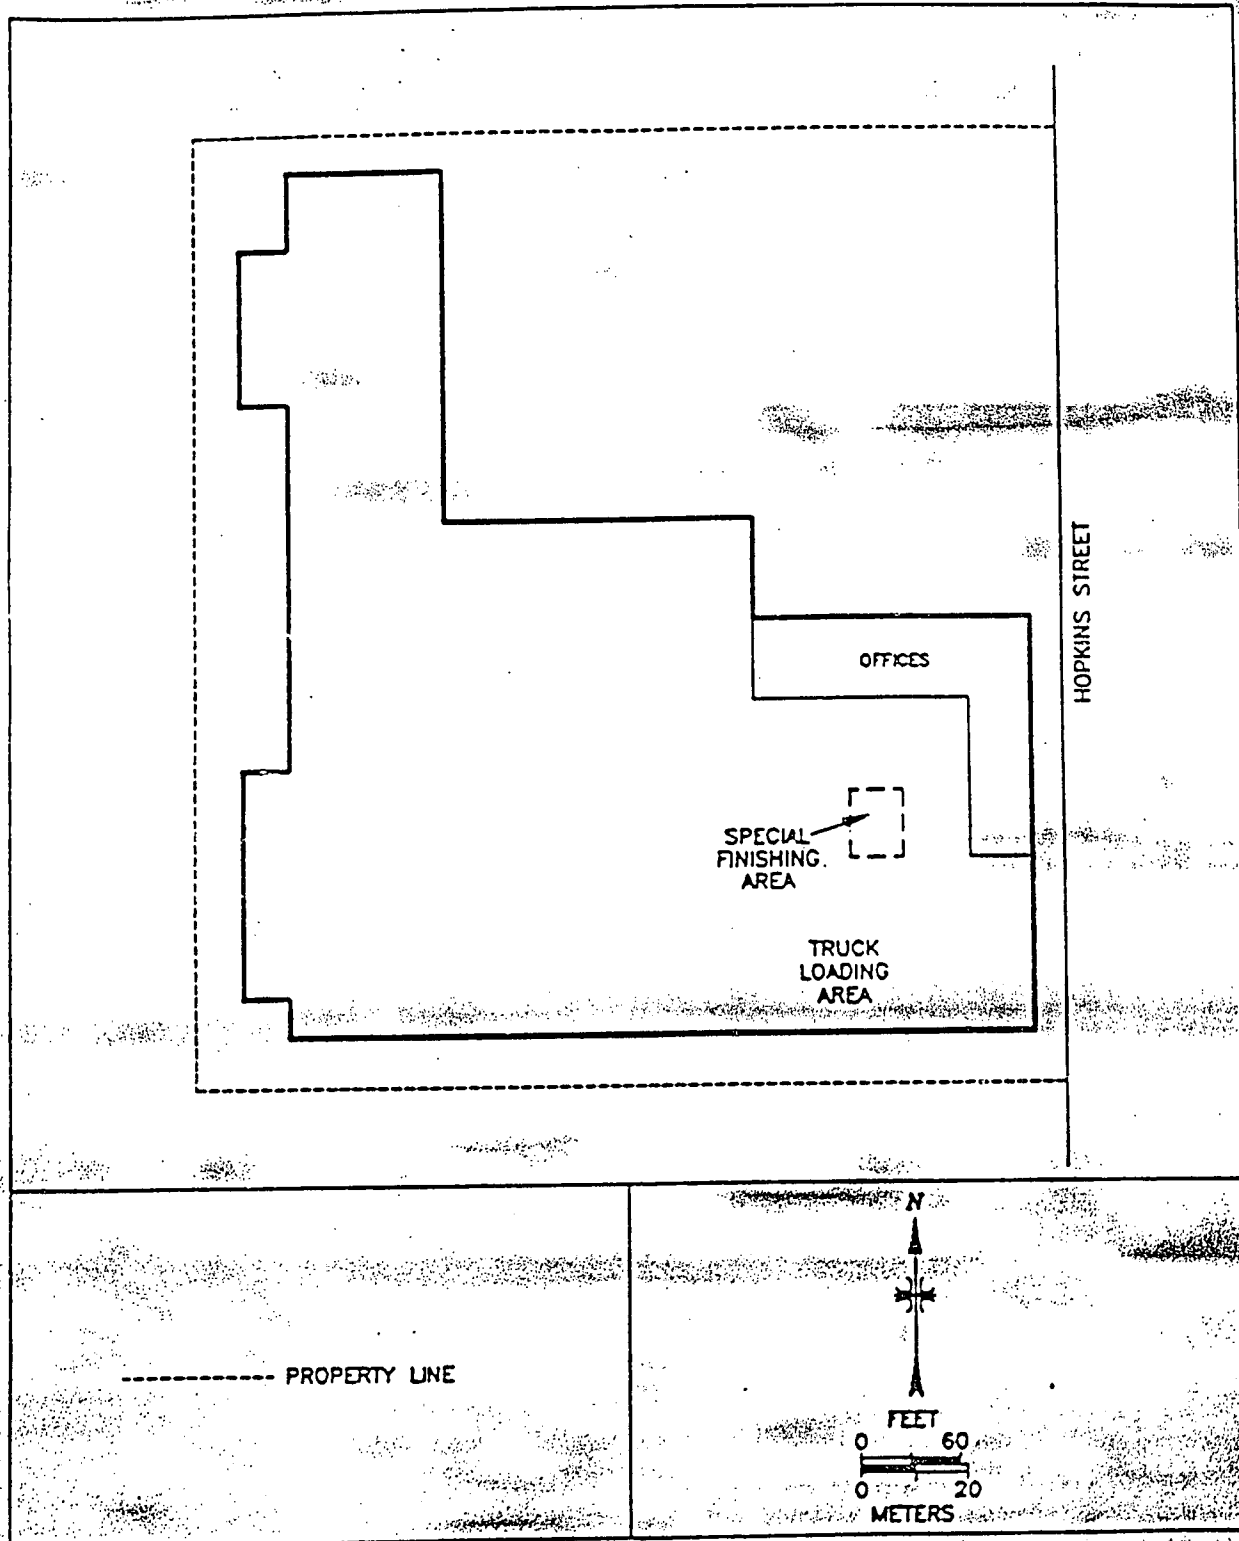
Plot Plan of Former Bliss and Laughlin Steel Company Facility
